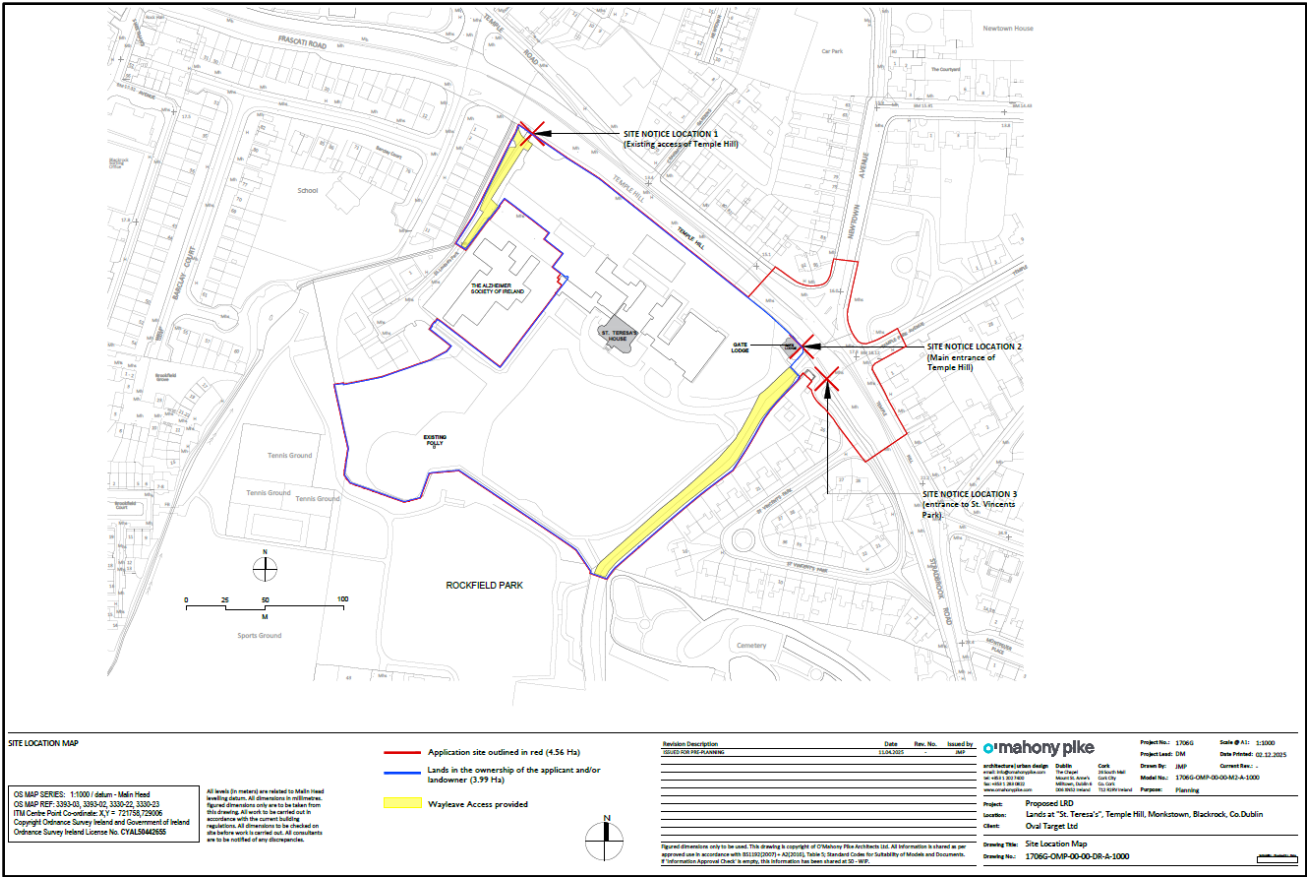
Proposed Development Site Location (Source O'Mahony Pike 2025)
